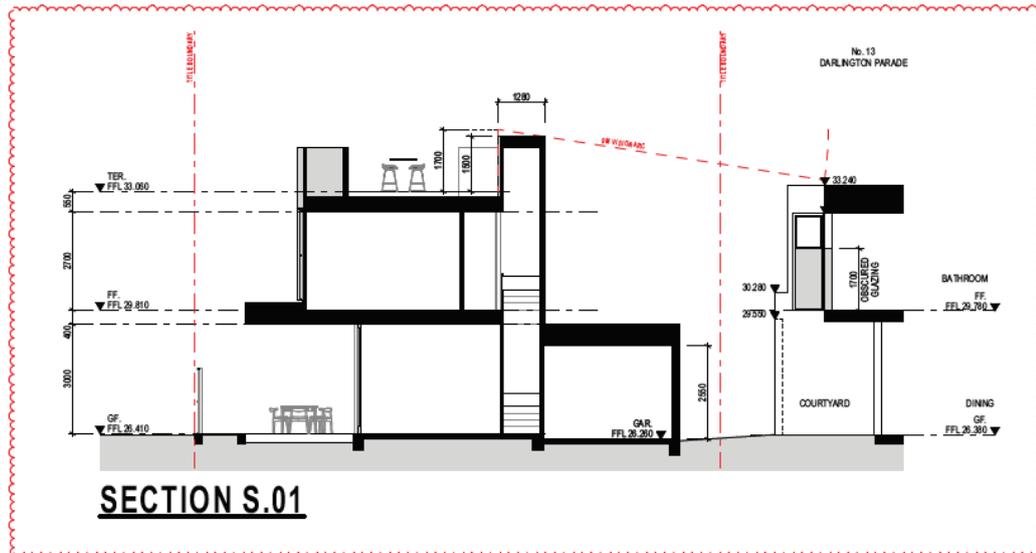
Overlooking diagram (submitted as a sketch plan on 5 July 2021)
